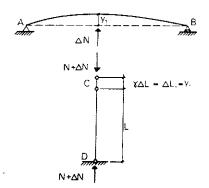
a. Fire exposed structure made up of a column CD hinged at its top end into a simply supported girder AB
